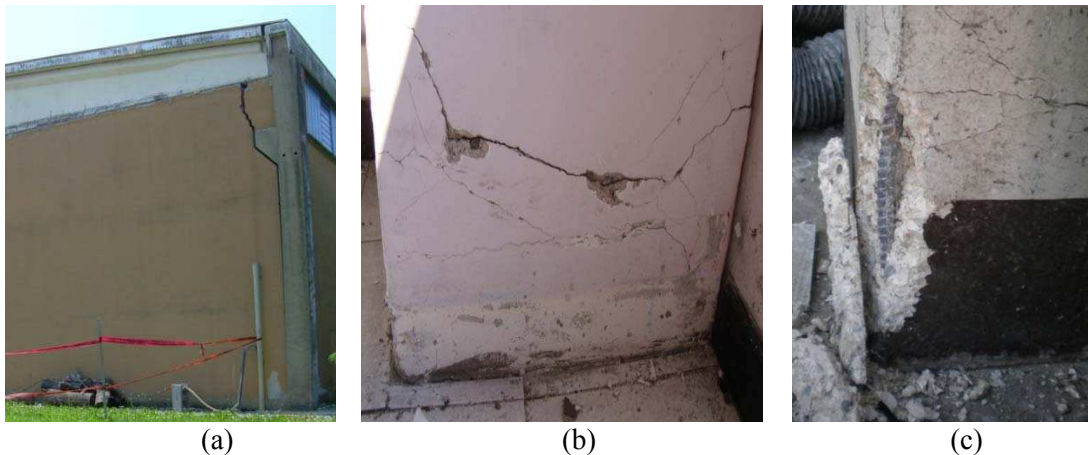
Damage in columns: (a) column loss of verticality due to rotation in the foundation element; (b) cracking of the base section in a column; (c) plastic hinge at the bottom of the column and buckling of a longitudinal bar at the base.
